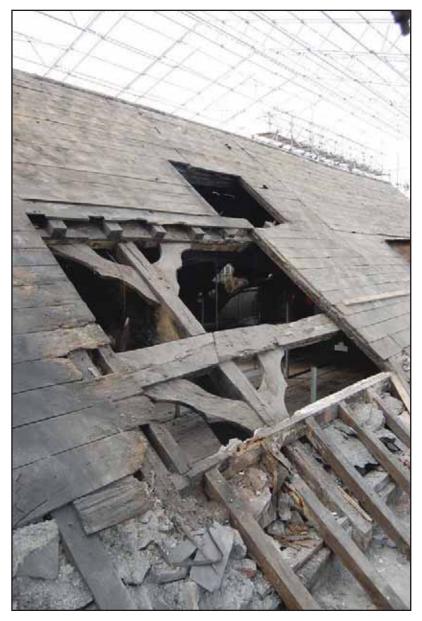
Old Grammar School External - view east of roof during renovation: wind brace and purlin detail
